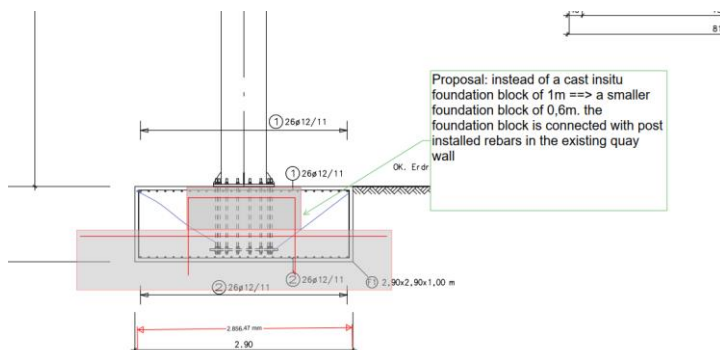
New concept of mounting the cable tower to the existing quay wall, based on drawing [2]
